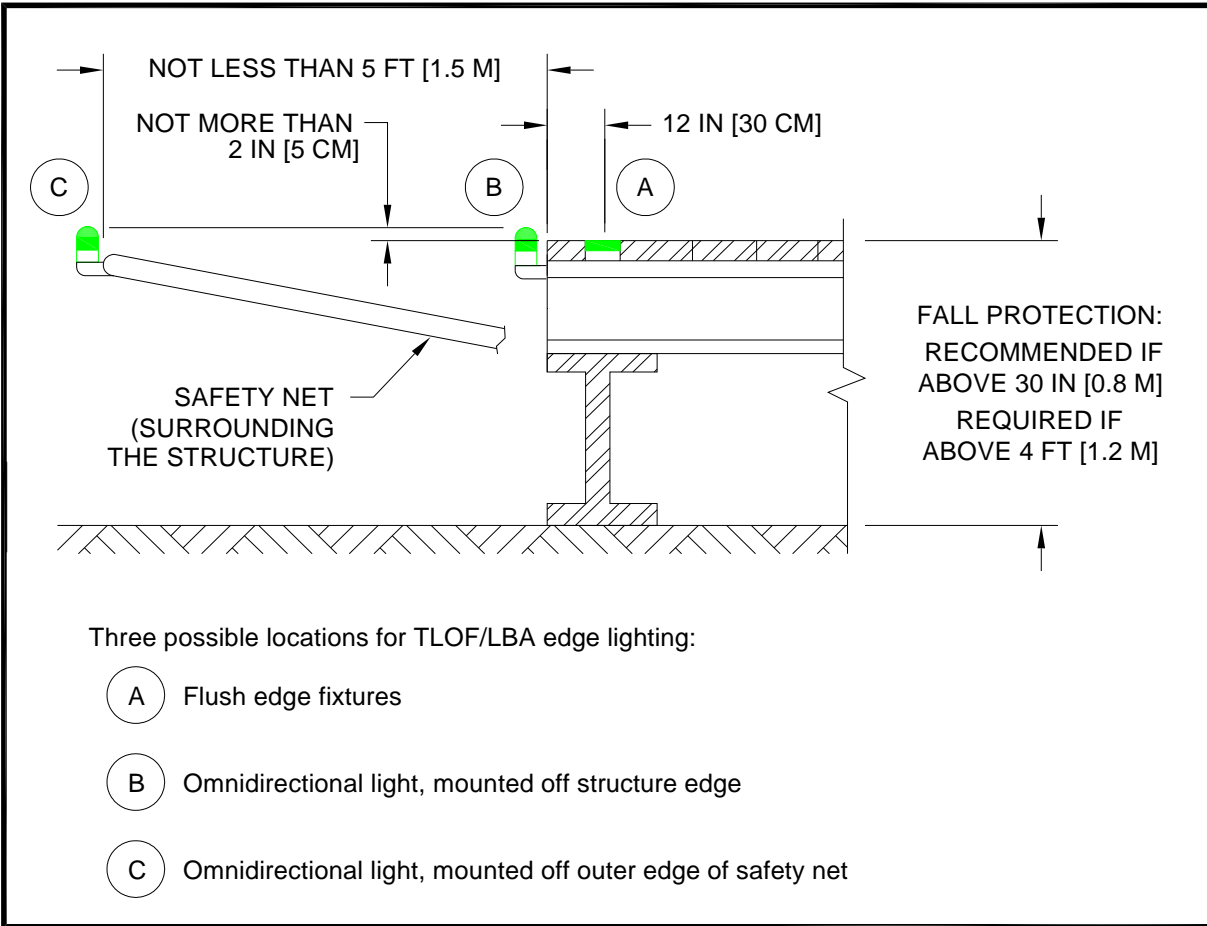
Elevated TLOF, Safety Net and Lighting Heliport Partial Elevation: Hospital
